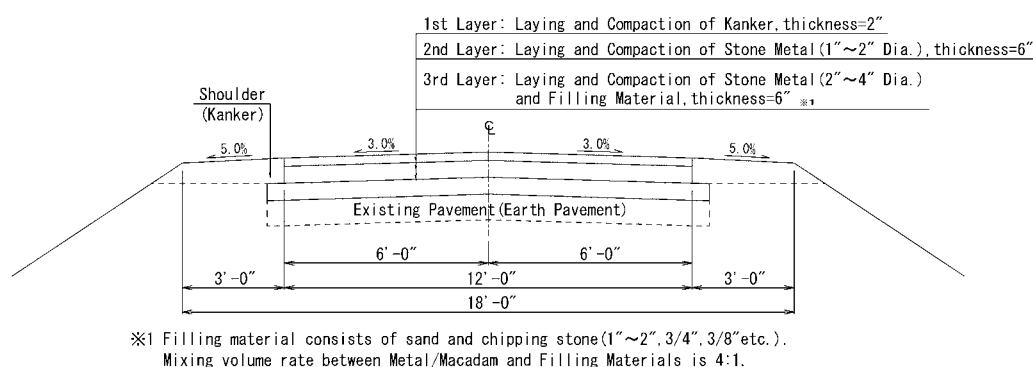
Typical Cross Section of Metal/Macadam (Rock) Pavement (Rural Road)
